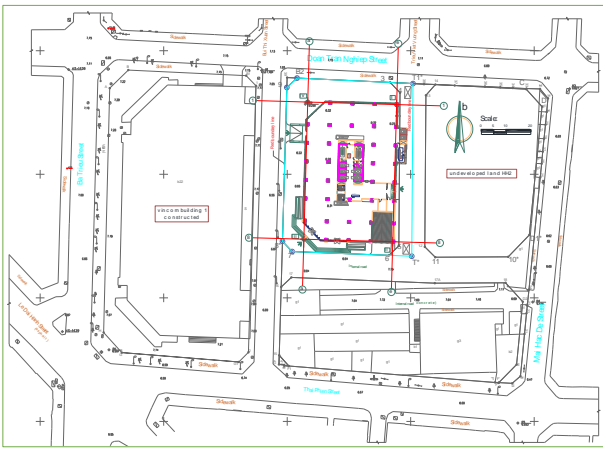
Construction site layout and characteristics of the surrounding construction area of the project
